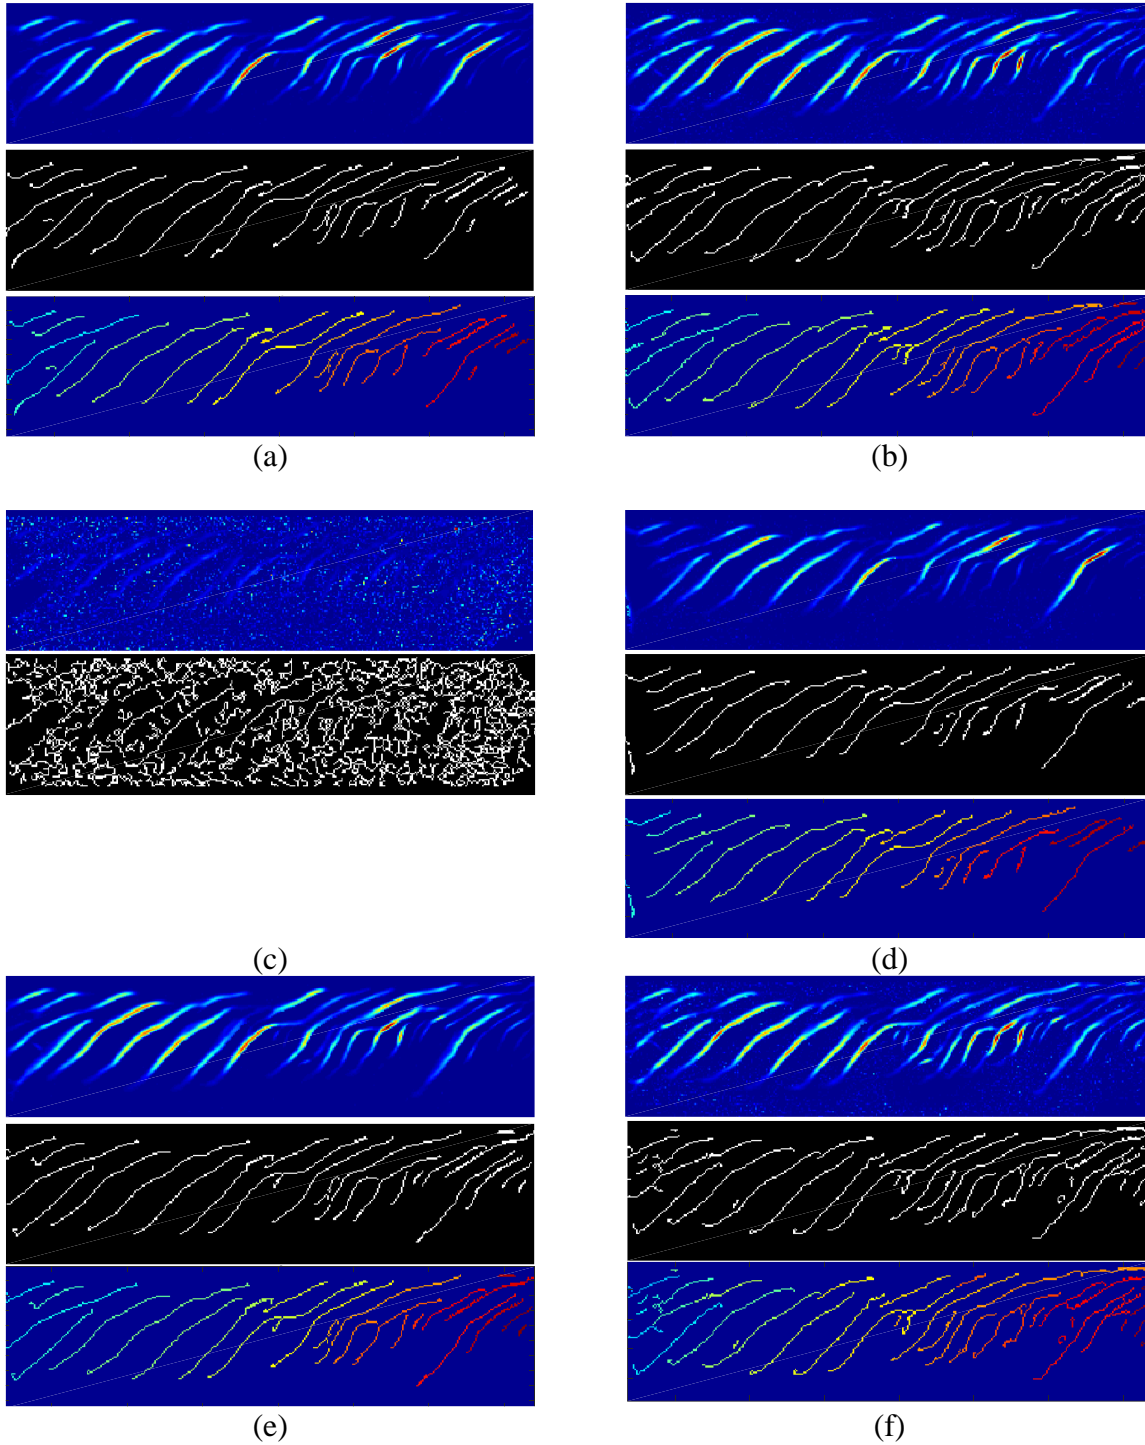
Crack shape reconstruction of Specimen N_2 .
